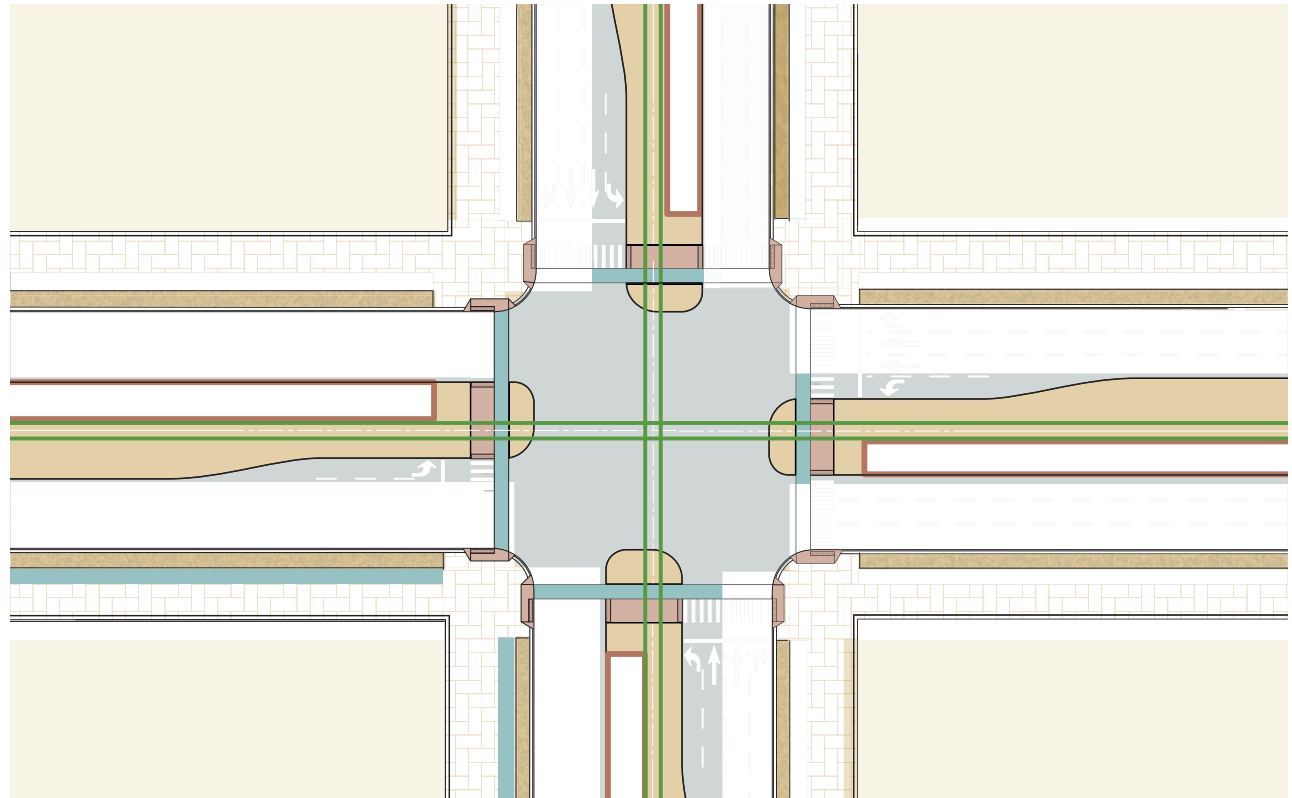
Typical Boulevard and Boulevard Junction with Tram and Cycle Track
